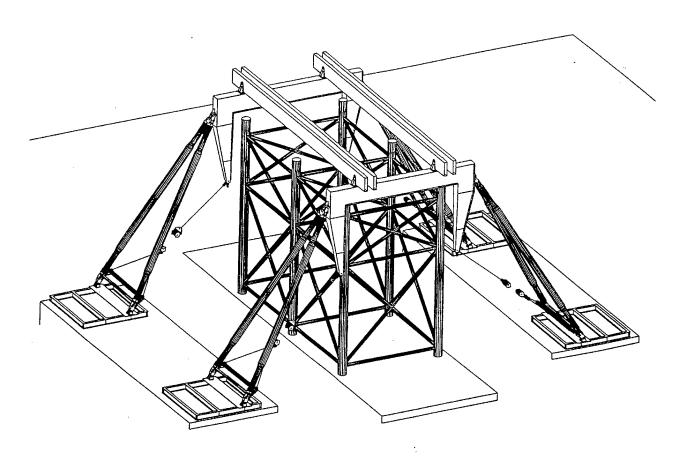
A proposed scheme to lower a large, flat, prefabricated module onto seafloor or riverbed using a Versatruss and a lift frame
